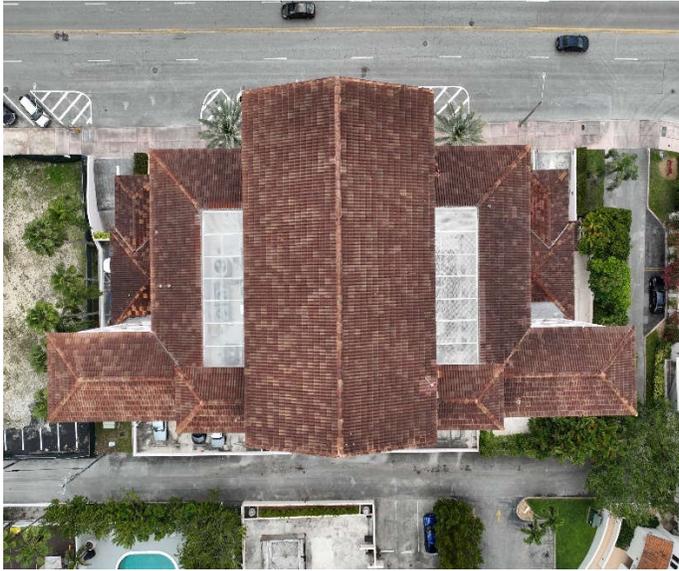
Overall view of the roof. (Mansard roof and gable roof with clay barrel tiles)
